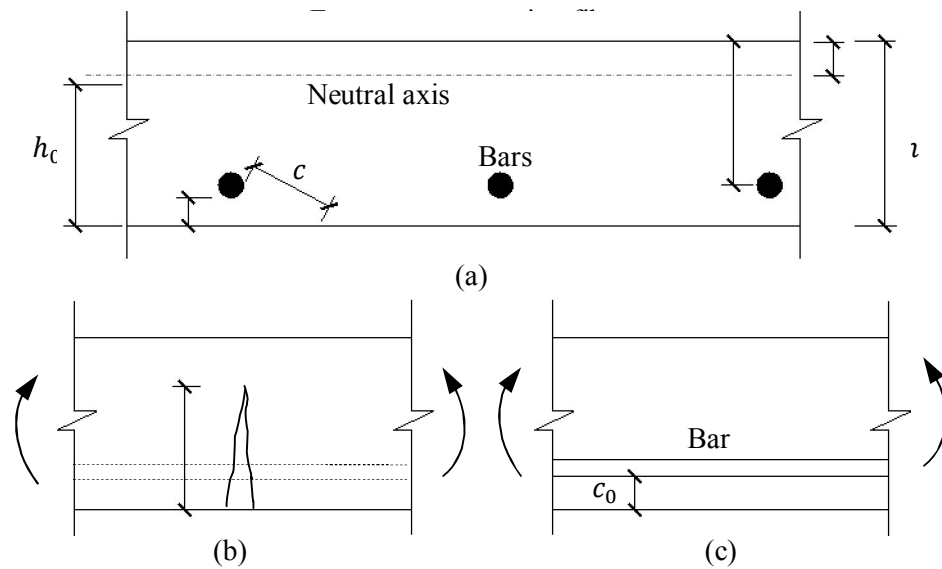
Influence of bar proximity on cracking in one-way slabs: (a) cross-section; (b) crack at distance from a bar, (c) crack at a bar.
